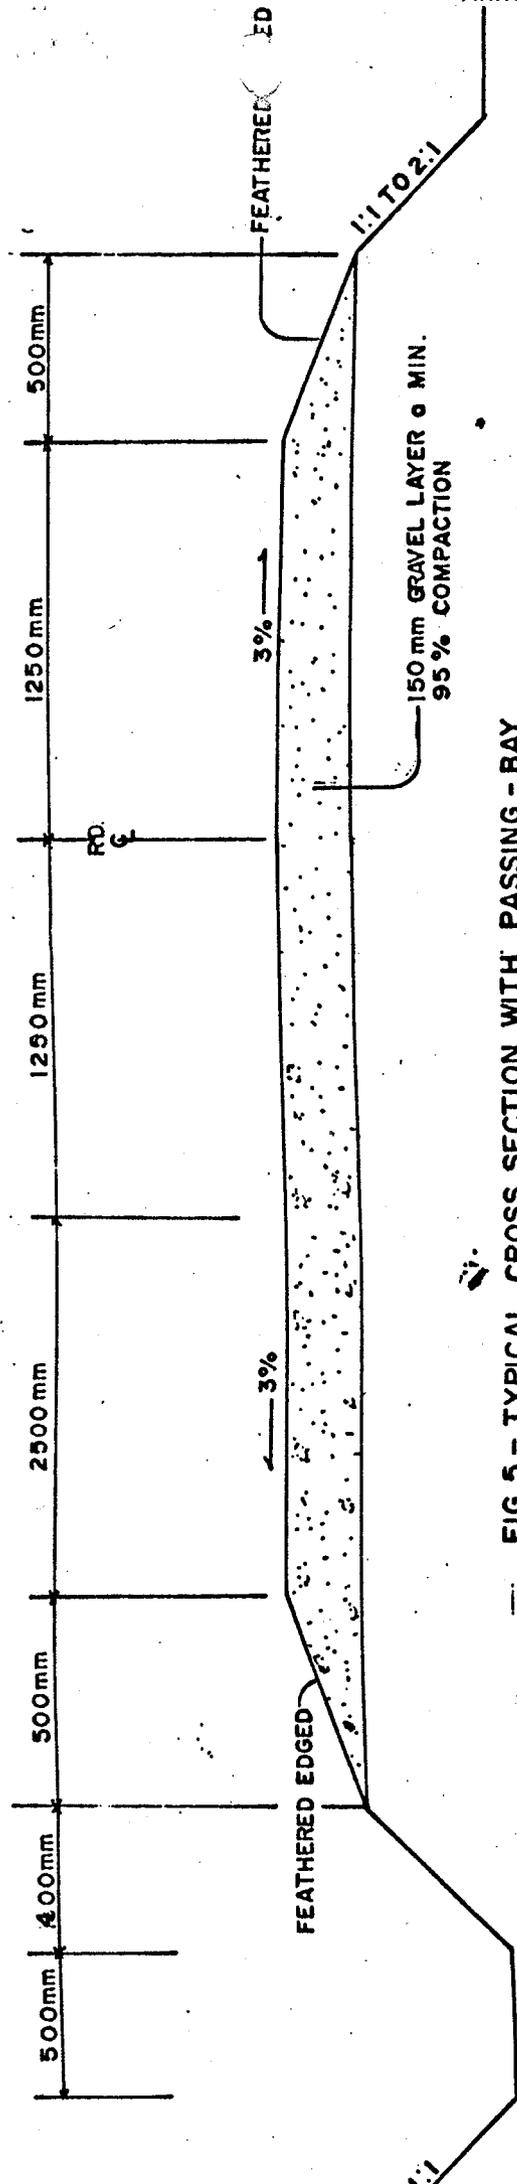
TYPICAL CROSS SECTION WITH PASSING - BAY (SECTION A - A)
